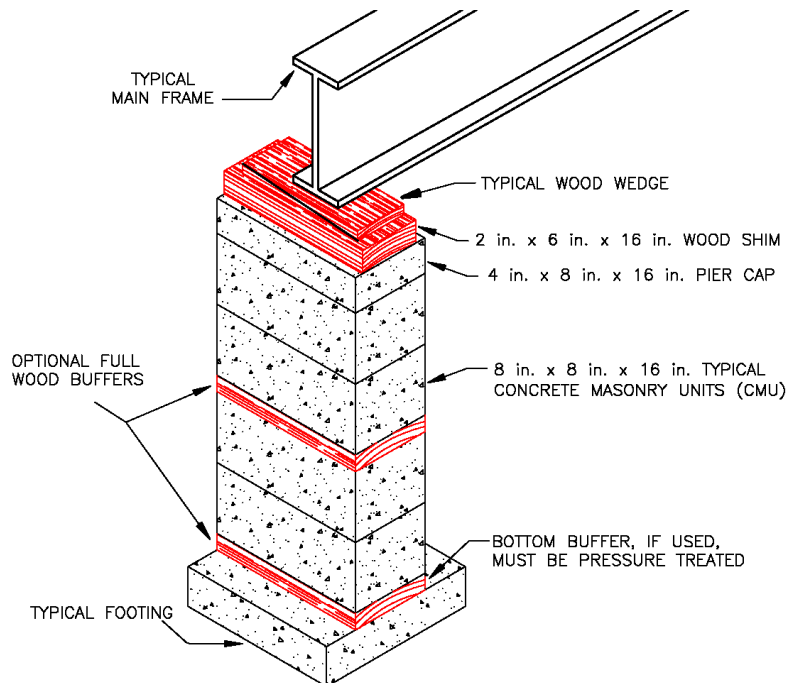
(a) Typical Recessed Pier Detail for Transverse Floors
